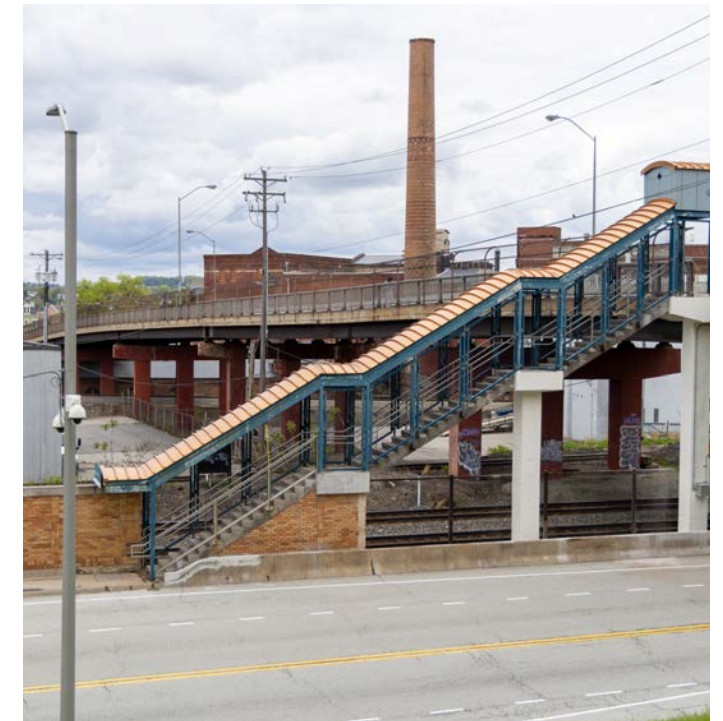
Covered steps connect the inbound platform to Herron Avenue
